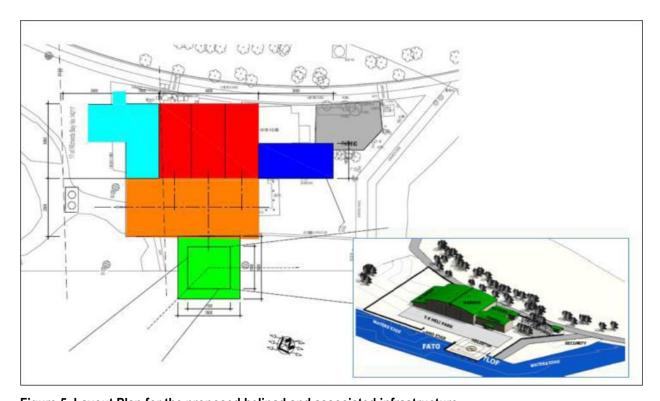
Layout Plan for the proposed helipad and associated infrastructure
